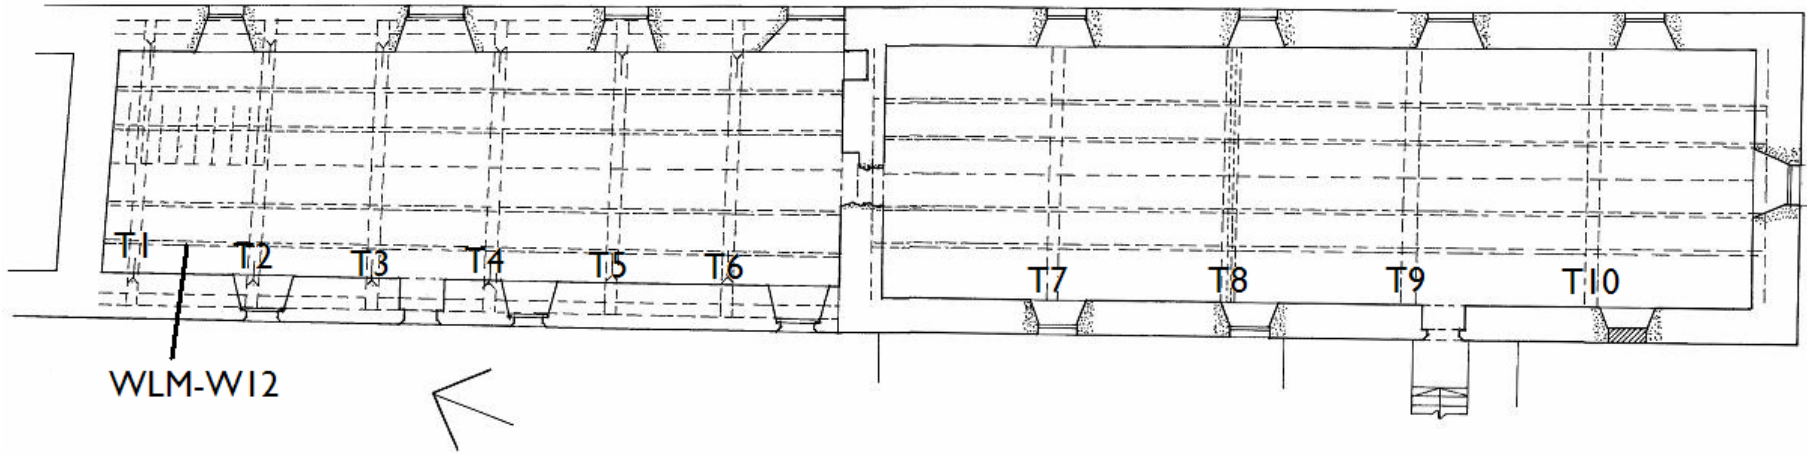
East range; roof plan, showing truss numbering and the location of sample WLM-W12
